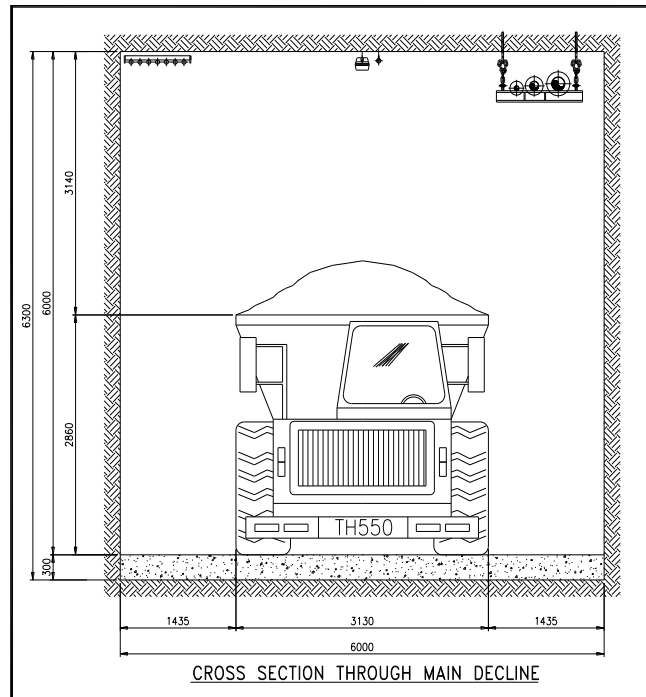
CROSS-SECTION OF TRACKLESS DECLINE
